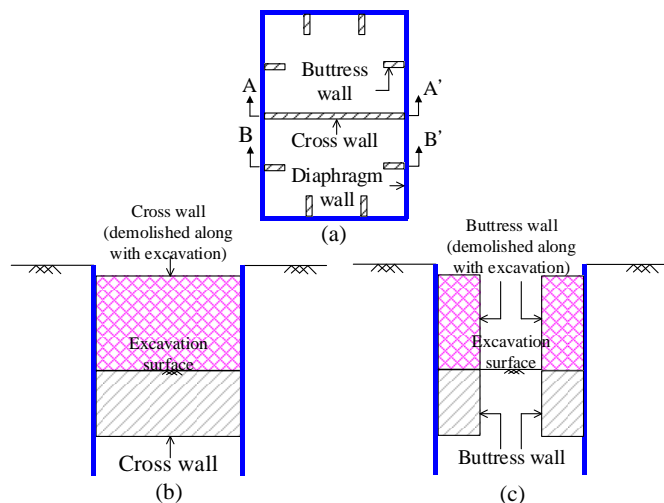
Schematic diagram of the cross wall and buttress wall (a) plan view, (b) section A-A', (c) section B-B'
